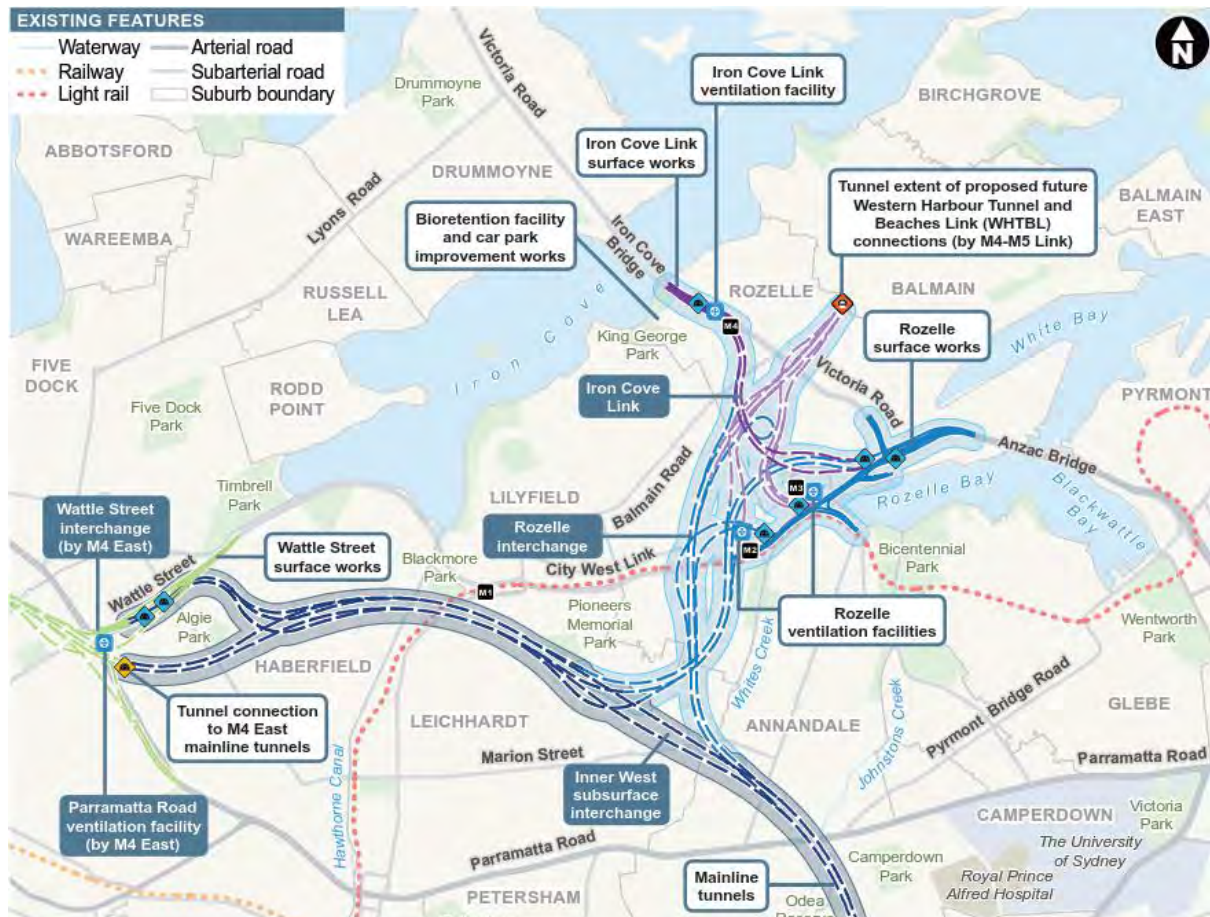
Construction sites for the M4-M5 Link and Rozelle Interchange near the subject site (Source: RMS)
